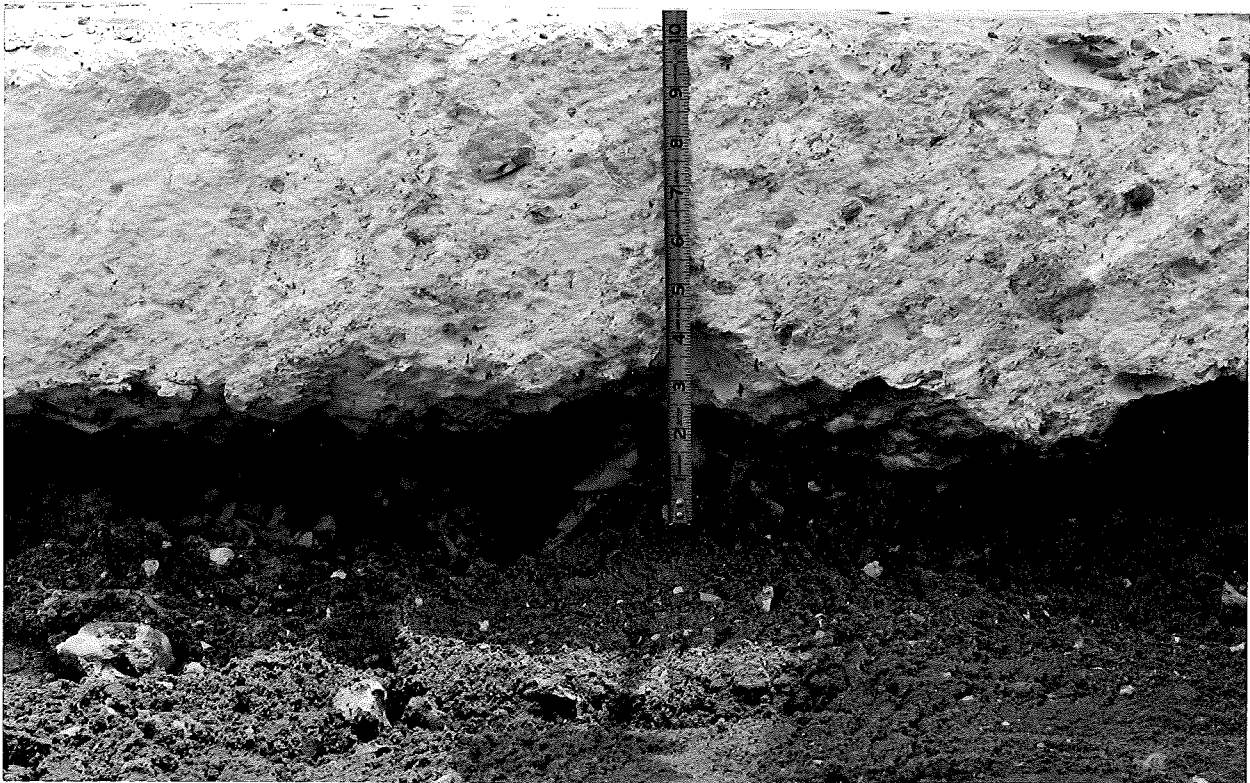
Undercutting of slab bottom. The most severe breaks occurred where the cutting wheel was lowered through the slab.
